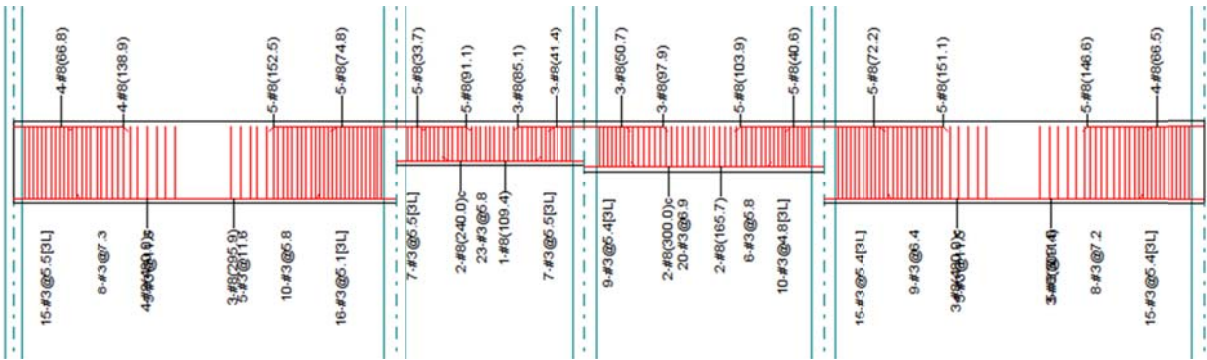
spBeam Column Line J Reinforcing Diagram (Lateral Loads)
